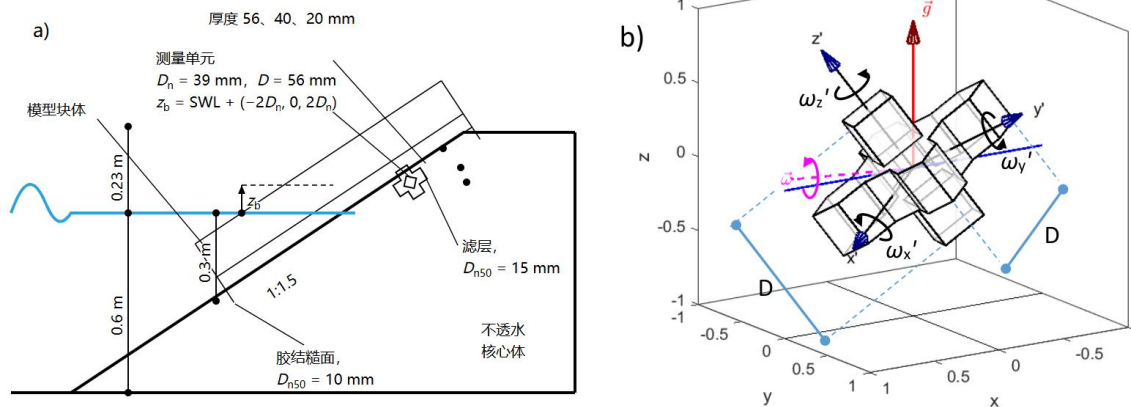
a) Side View of Setup of Armour Layer on Slope; b) Definition of Axes Used
